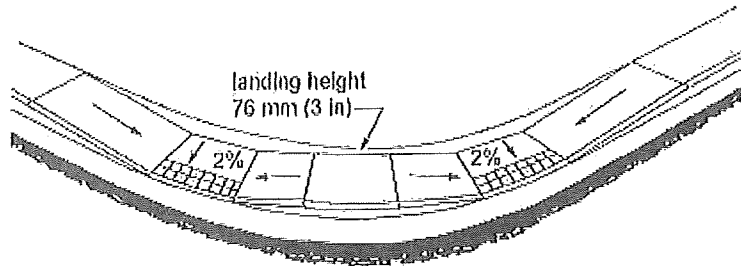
At intersections with narrow sidewalks and wide turning radii, two parallel curb ramps should be considered.
